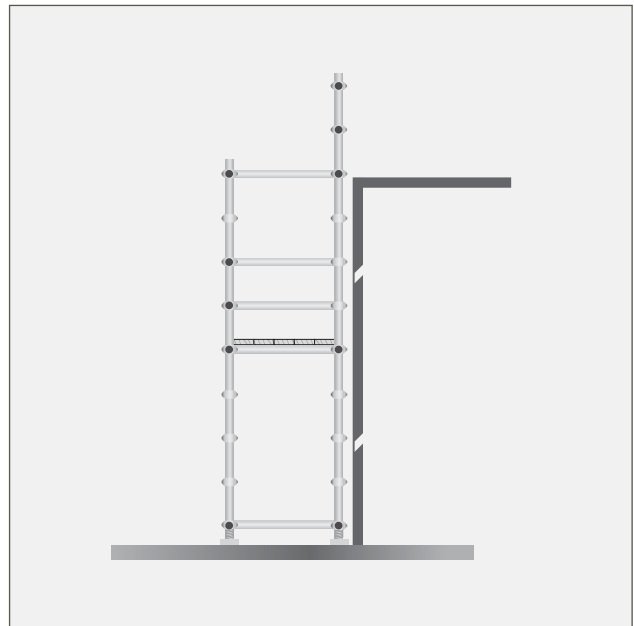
(f) Inside standards supporting guardrailing adjacent to a flat roof structure.
